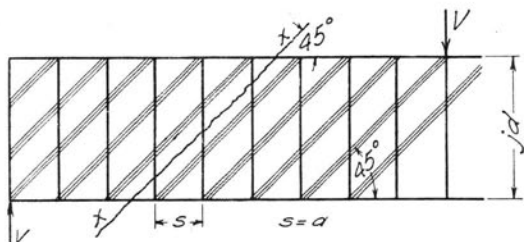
TRUSS WITH VERTICAL TENSION WEB MEMBERS
